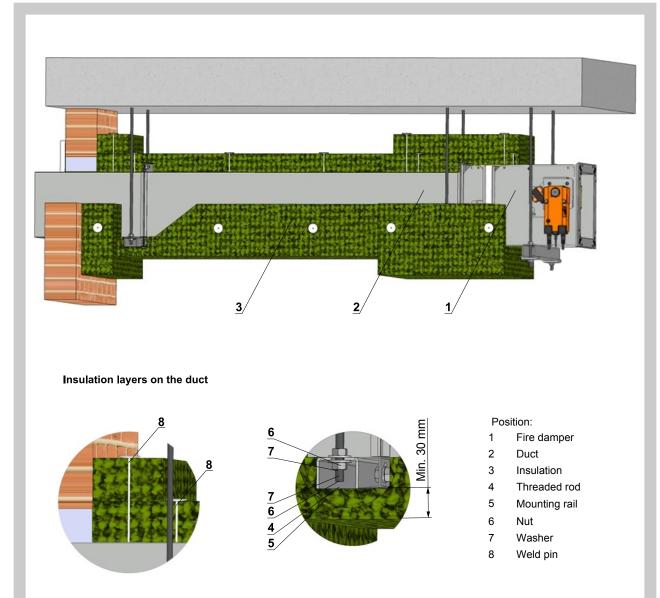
Rectangular fire damper suspension on the wall - horizontal installation
